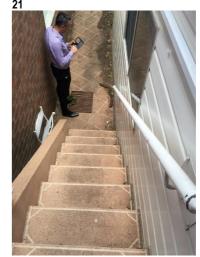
Photo References: 137–141 Keira Street—137, Upper Floor (Residential)
